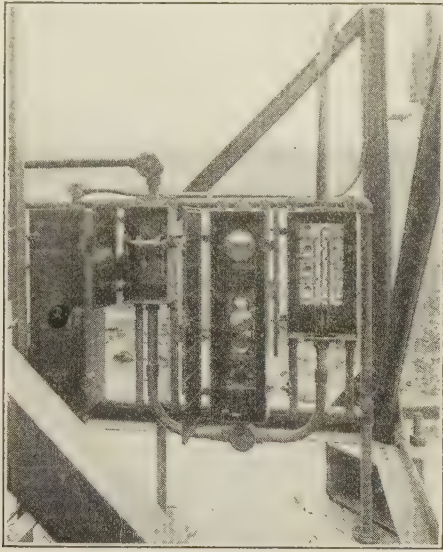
TYPICAL SWITCH, METER AND CUTOUT INSTALLATION AT BASE OF TOWER
